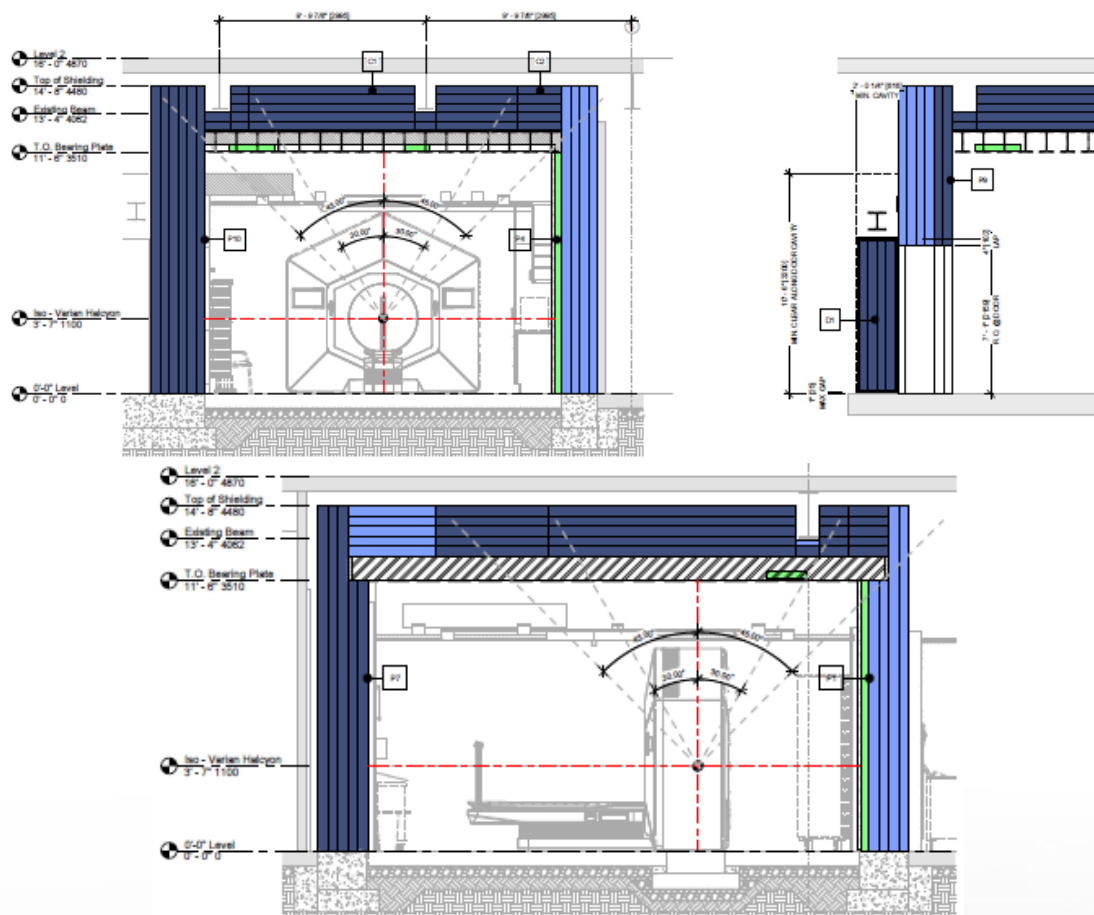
Layout of a vertical sections showing doors of the treatment rooms (room 1 on right, room2 on Left)
